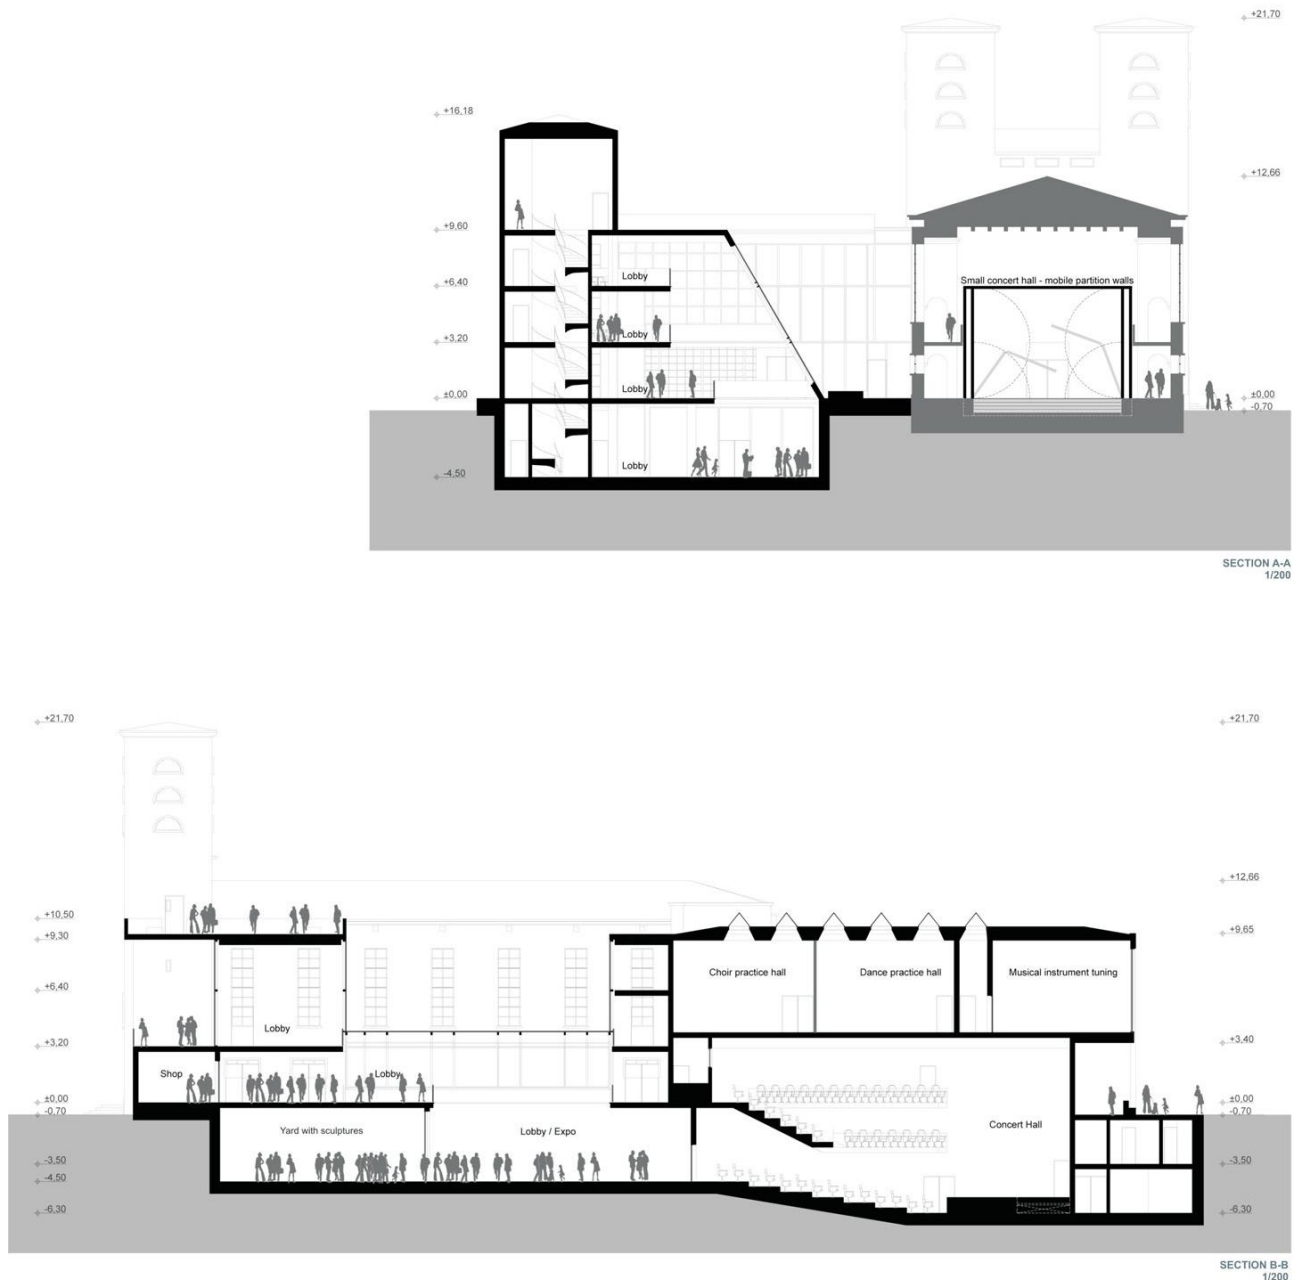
Main cross sections /up- transversal section with the church St.Paul, down- longitudinal section.
